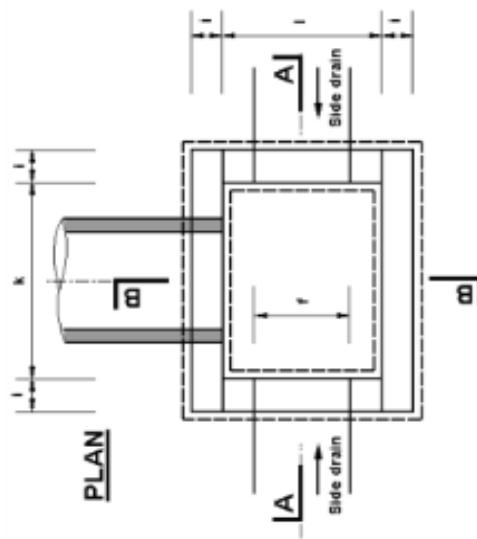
HEADWALL TYPE 3A (CONCRETE BLOCK HEADWALLS)
